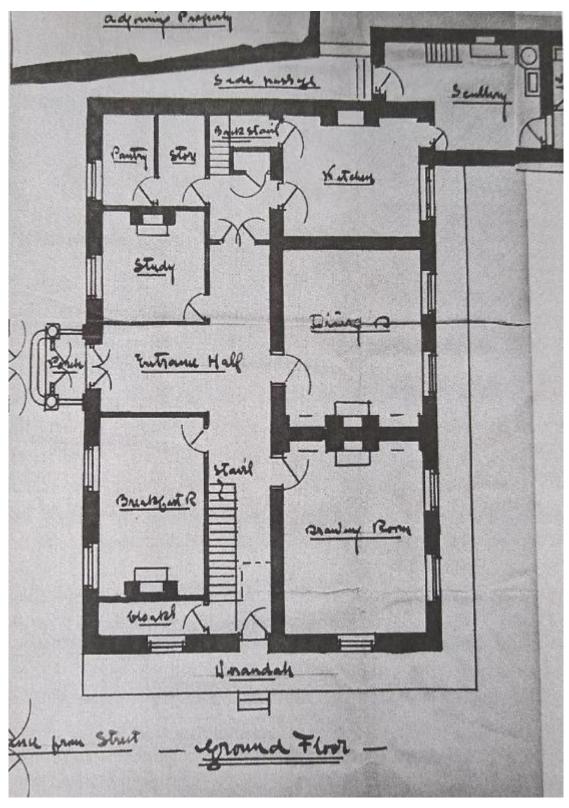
Ground floor plan of Rumsey House (supplied by E. Harries)
